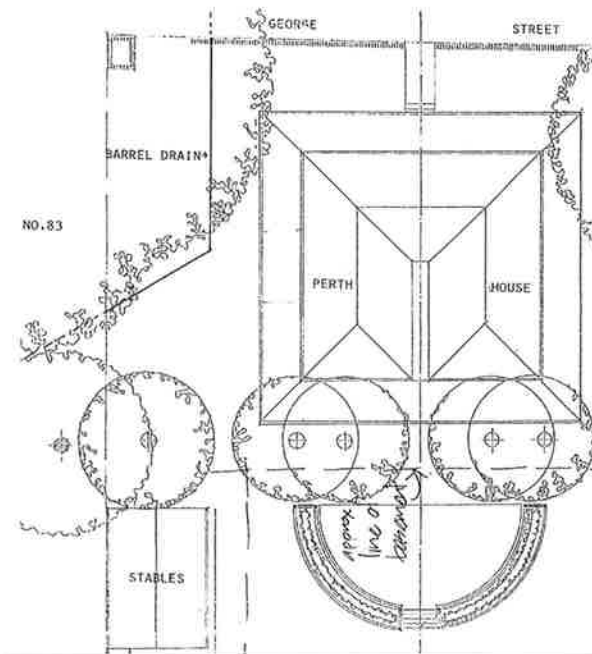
Plan of Perth House showing site of convict drain. [Source; D Bairstow, Perth House, Historical Archaeology Report. Figure 30. p.52
